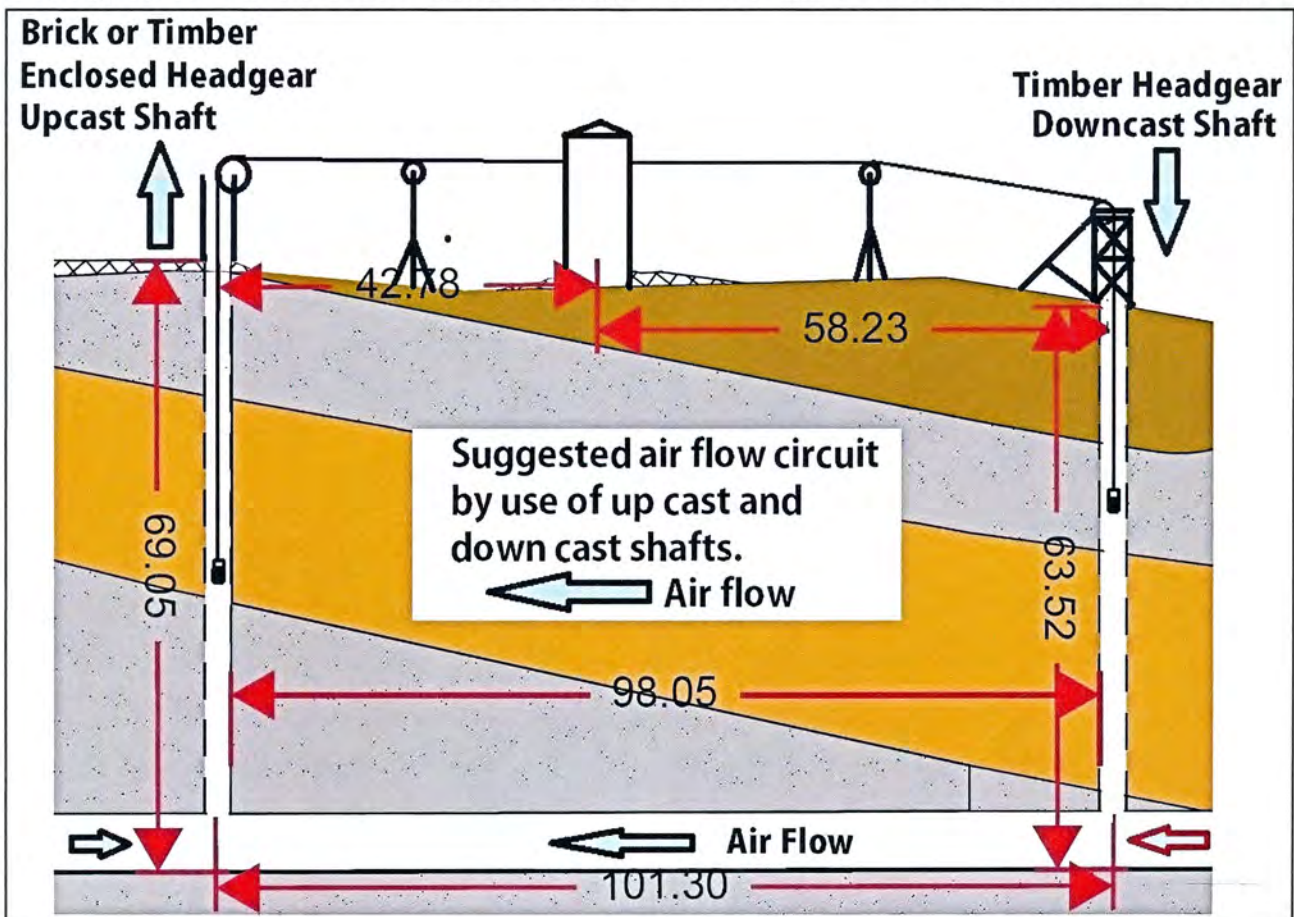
Suggested ventilating arrangement in use during tunnel construction.
